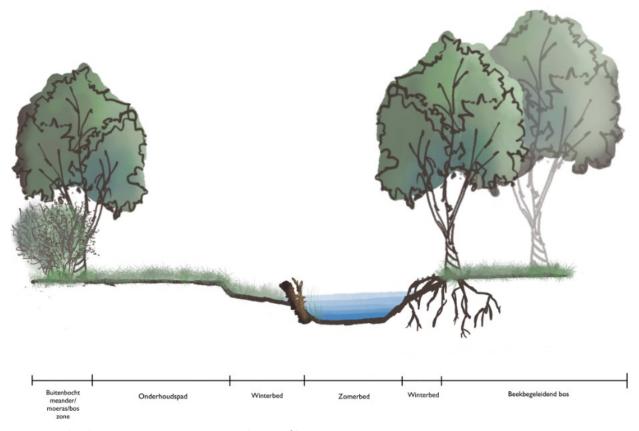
Sketch cross section 2, one-way two-phase profile.
